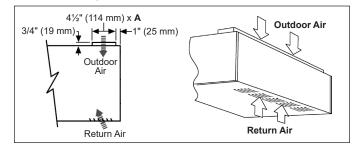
Arrangement 27 - Return Air Bottom Grille/ Outdoor Air Rear Duct Collar
